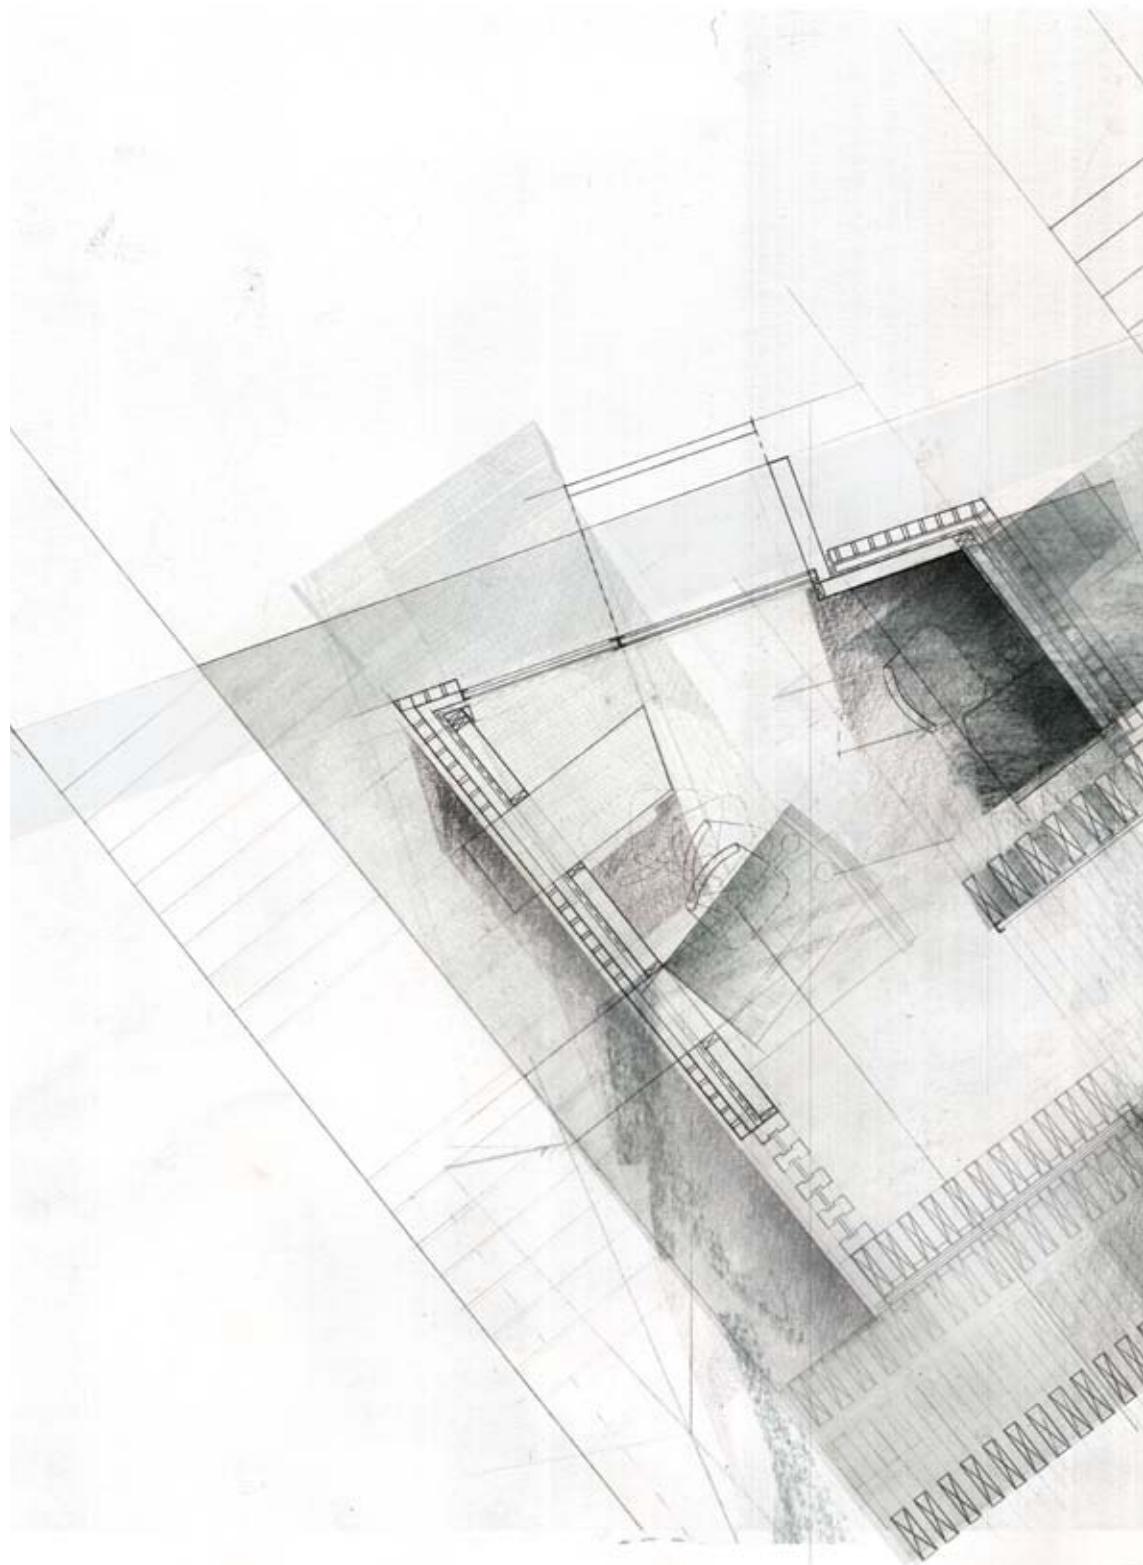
(previous, tracing paper): Lower floor plan presented at 1:20 illustrating meeting space and kitchenette. Blurring is established through lighting variances and the movement of glazing systems to inform new spatial working or rest zones. Created by Author. Hand drawn (1:20 @ A2) and digitally composed.
